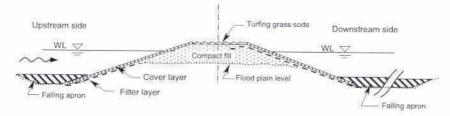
Typical cross-section of an impermeable groyne (non-submerged)
